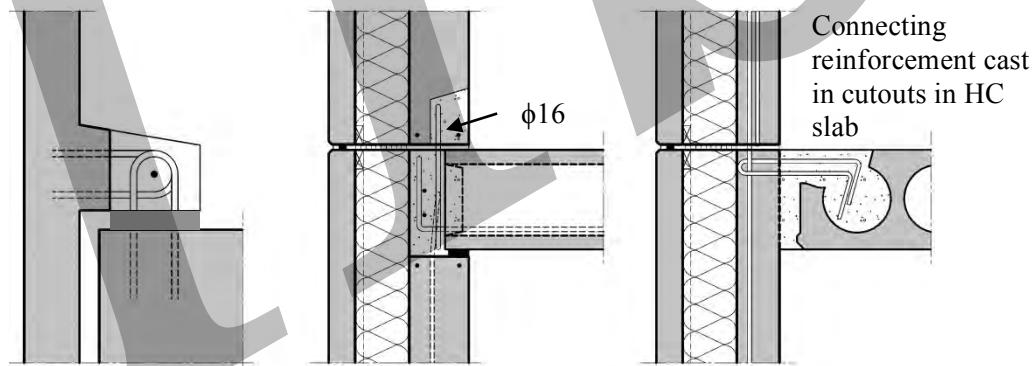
Connection with projecting reinforcement and in-situ concrete
